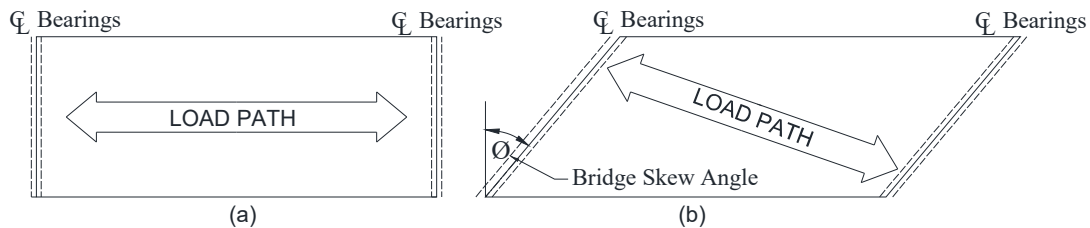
Load paths in (a) non-skewed and (b) skewed bridges.
